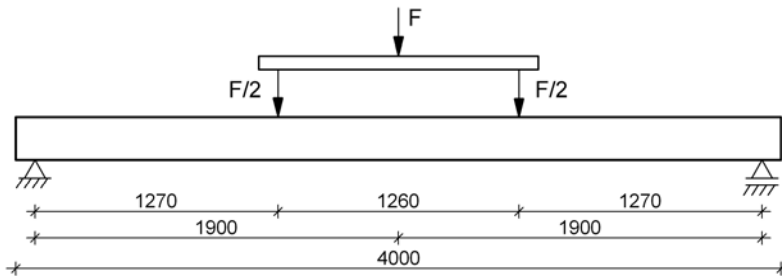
Loading configuration and dimensions of tested beams in [mm]
